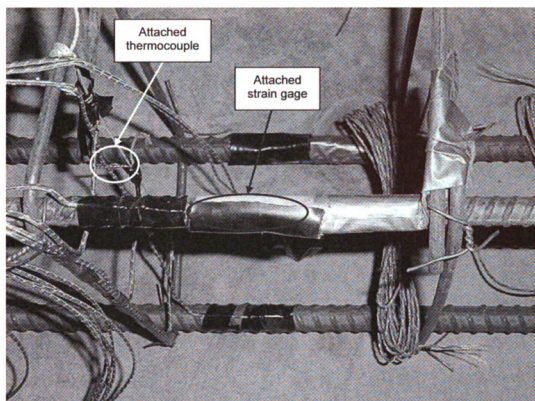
View of a Thermocouple and a Strain Gage attachment to Beams
